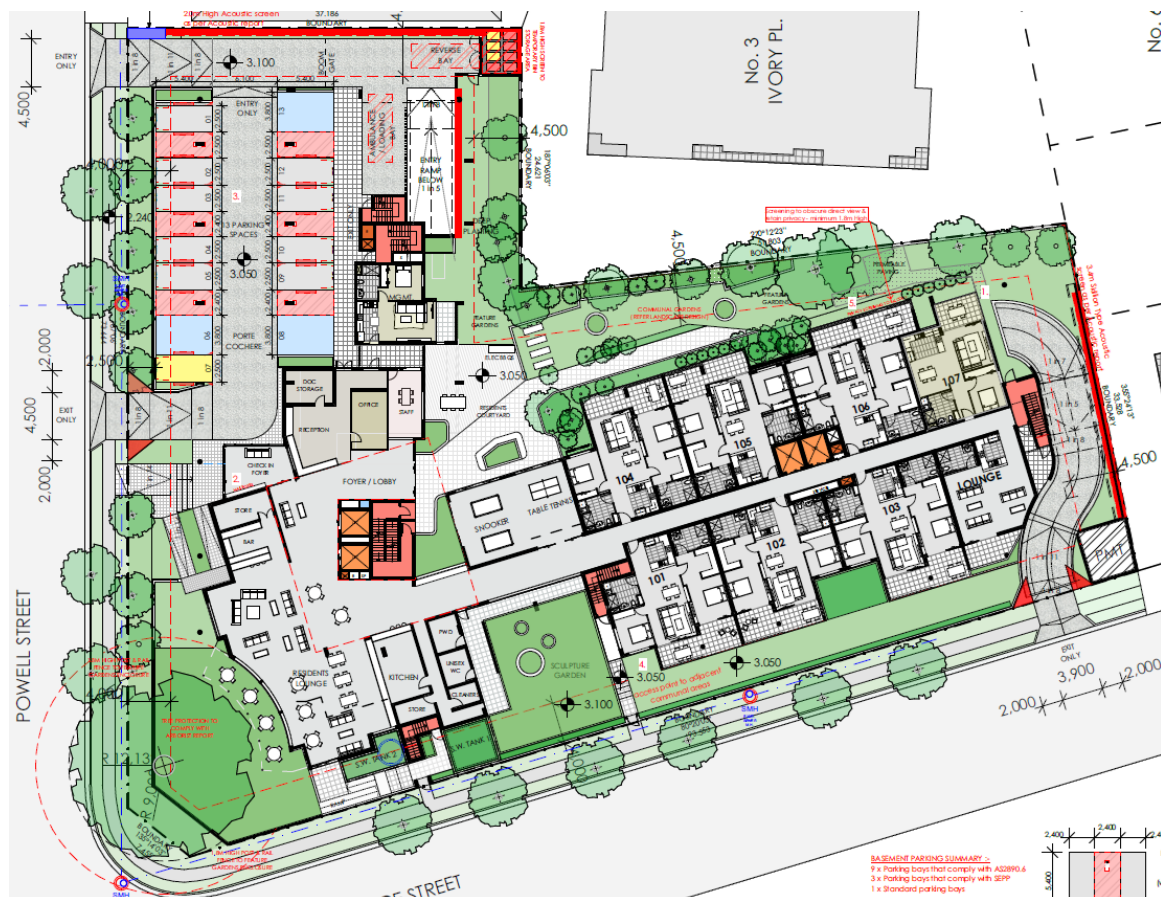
Ground floor level, as amended, showing vehicle entries and exit include to porte cochere in north western corner, adjacent to Powell Street.
